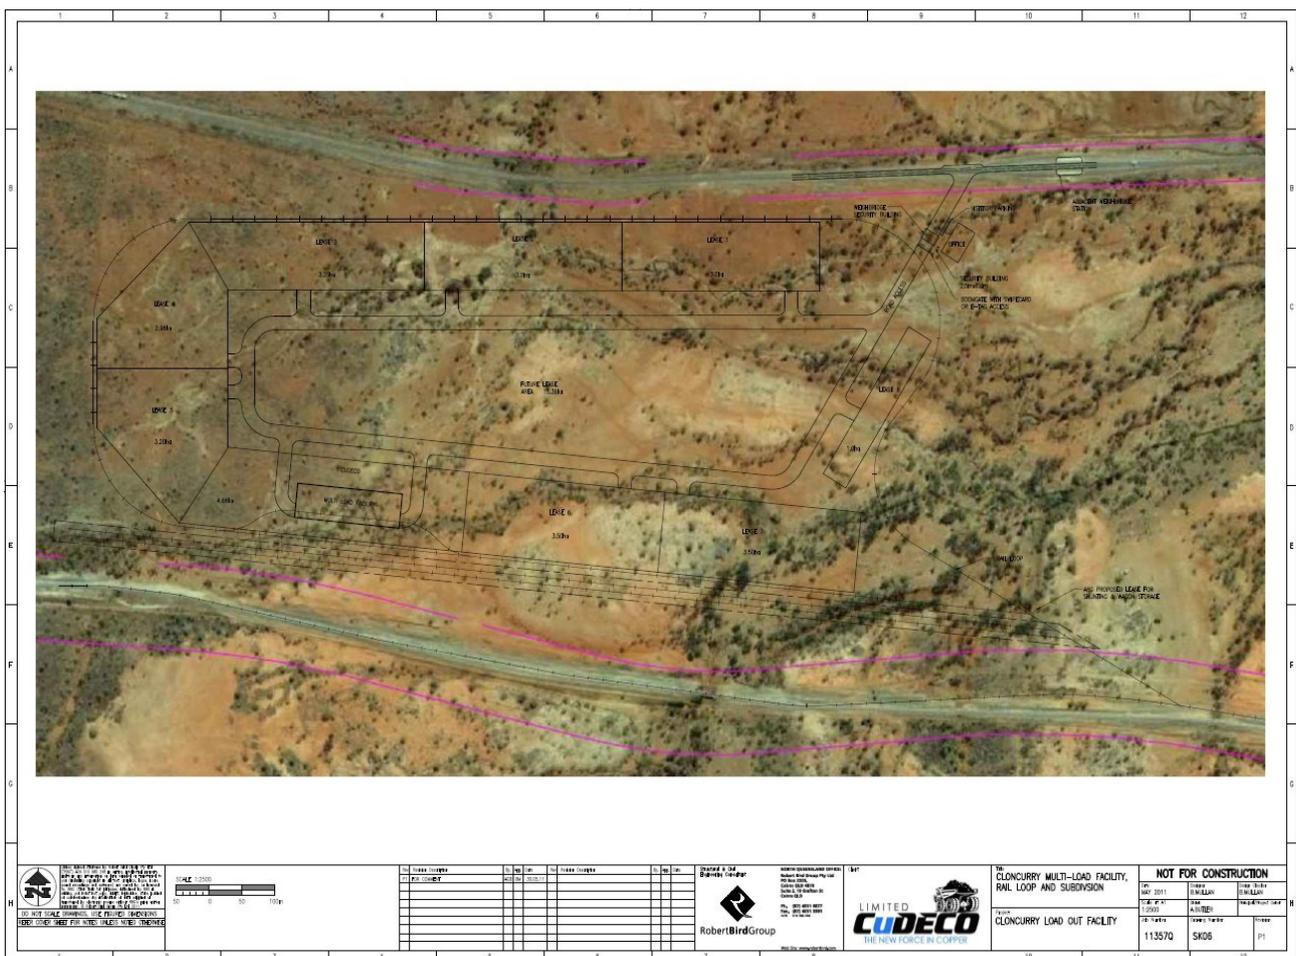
Detail of Cloncurry Multi-load Facility, Rail Loop Subdivision - Preliminary Design Layout
